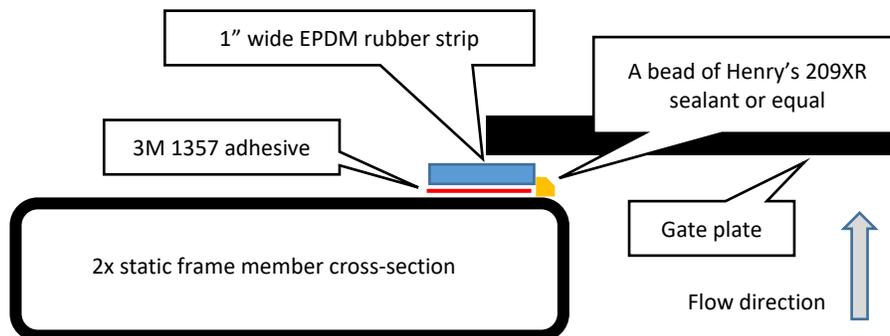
Cross-section view of the final gate to frame gasket assembly (plan view)
